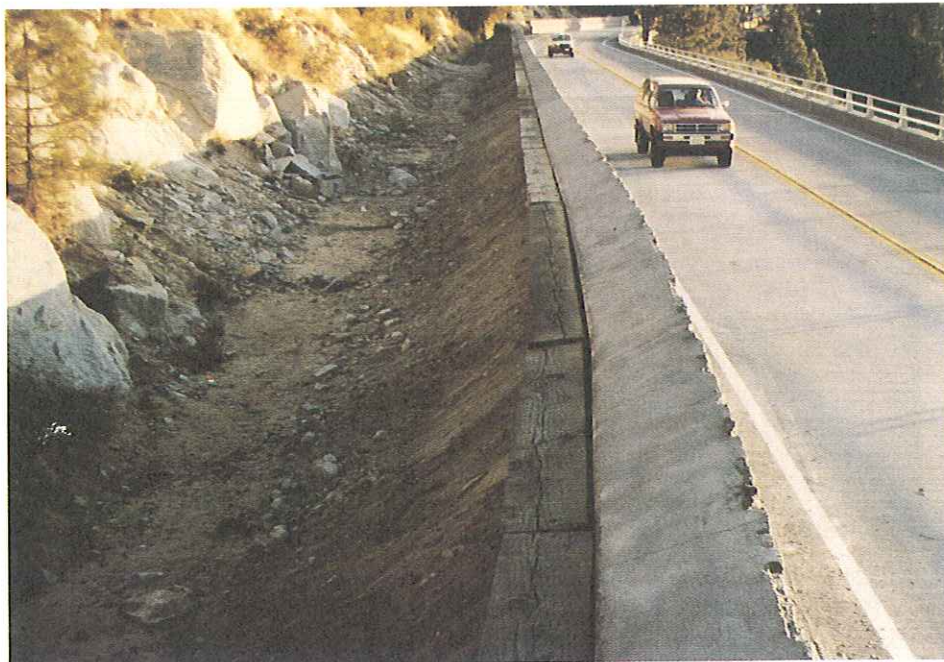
Catch ditch below boulder till slope. A concrete wall is backed with soil and timbers as a buffer (*Courtesy FWHA/Caltrans*).
